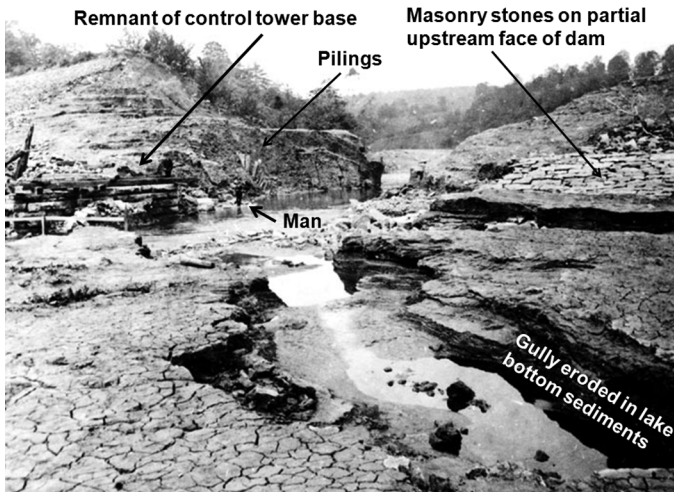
View of the former lake bed upstream of the dam. An erosional gully is carved in the lake-bottom sediments. The structure at left center includes remnant of the former control tower and stone culvert. Remains of hemlock pilings used to block the culvert are also visible in the middle of the breach on the left side, near a man standing beside the stream. Masonry covering part of the upstream side of the dam can be seen on the right. Figure courtesy of the Johnstown Area Heritage Association.
